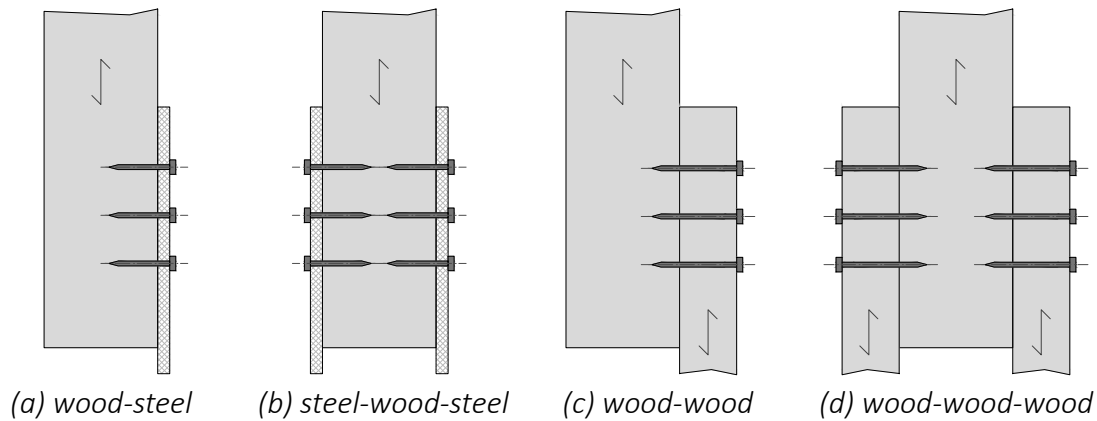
Side view of the possible configurations in connections with partially penetrating small diameter dowel-type fasteners.
